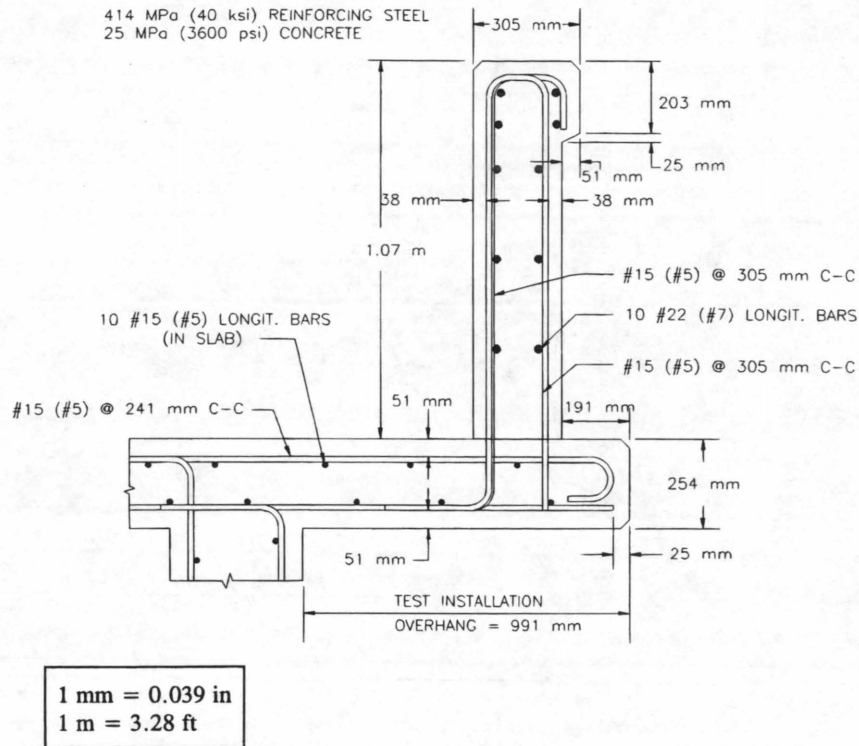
Cross section of 1.07-m (42-in.) concrete parapet.
